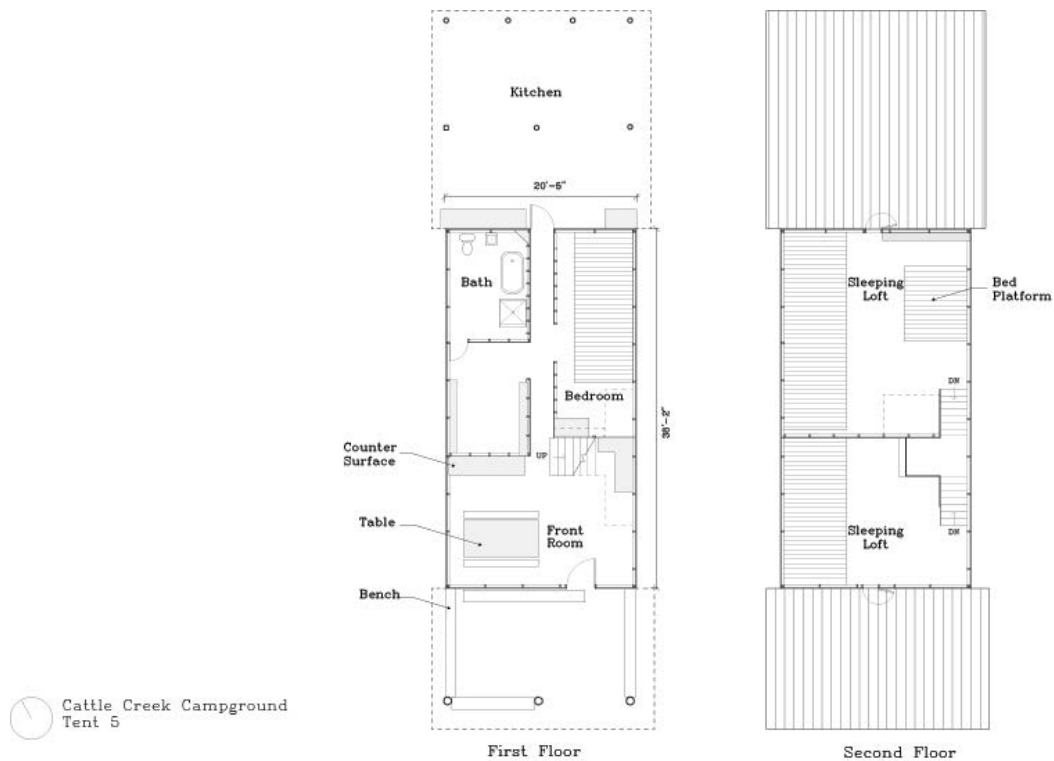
Floor plan of Tent 5 at Cattle Creek. Traces of how the ground floor used to be arranged can still be made out through the wall placement. Illustration by author.
